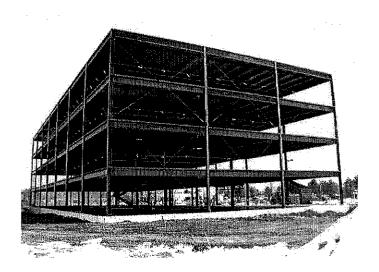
Partially completed steel building (Source: American Institute for Steel Construction, AISC)
